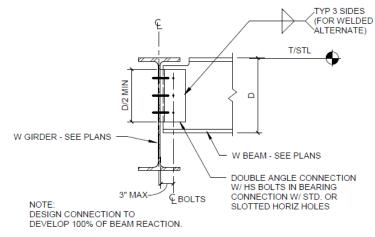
Beam-to-Girder Connection (Sheet S-5.01 Detail 5)
